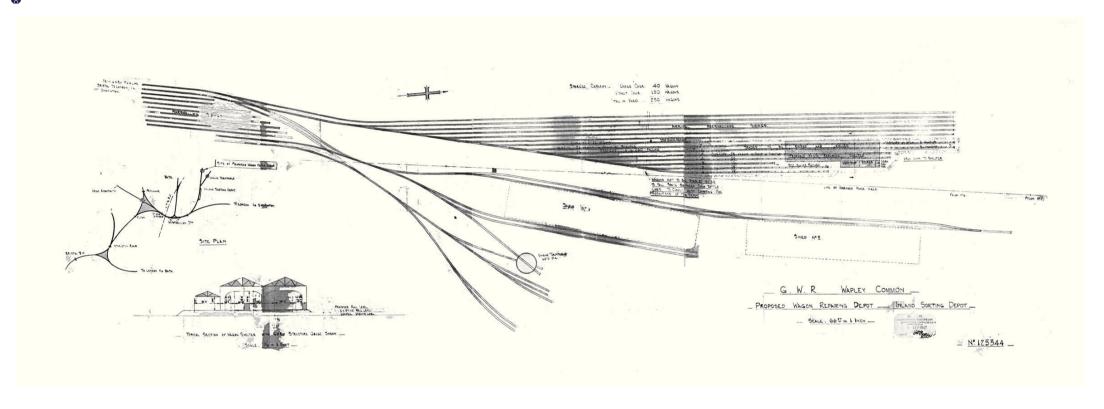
1947 plan showing proposal for wagon repair depot at site
